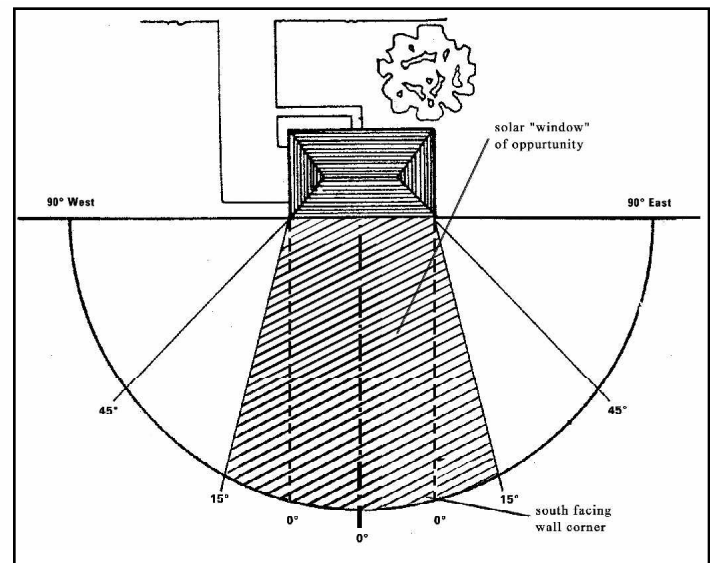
A house can be angled as much as 15 degrees east or west of true south and still collect useful solar heat.
